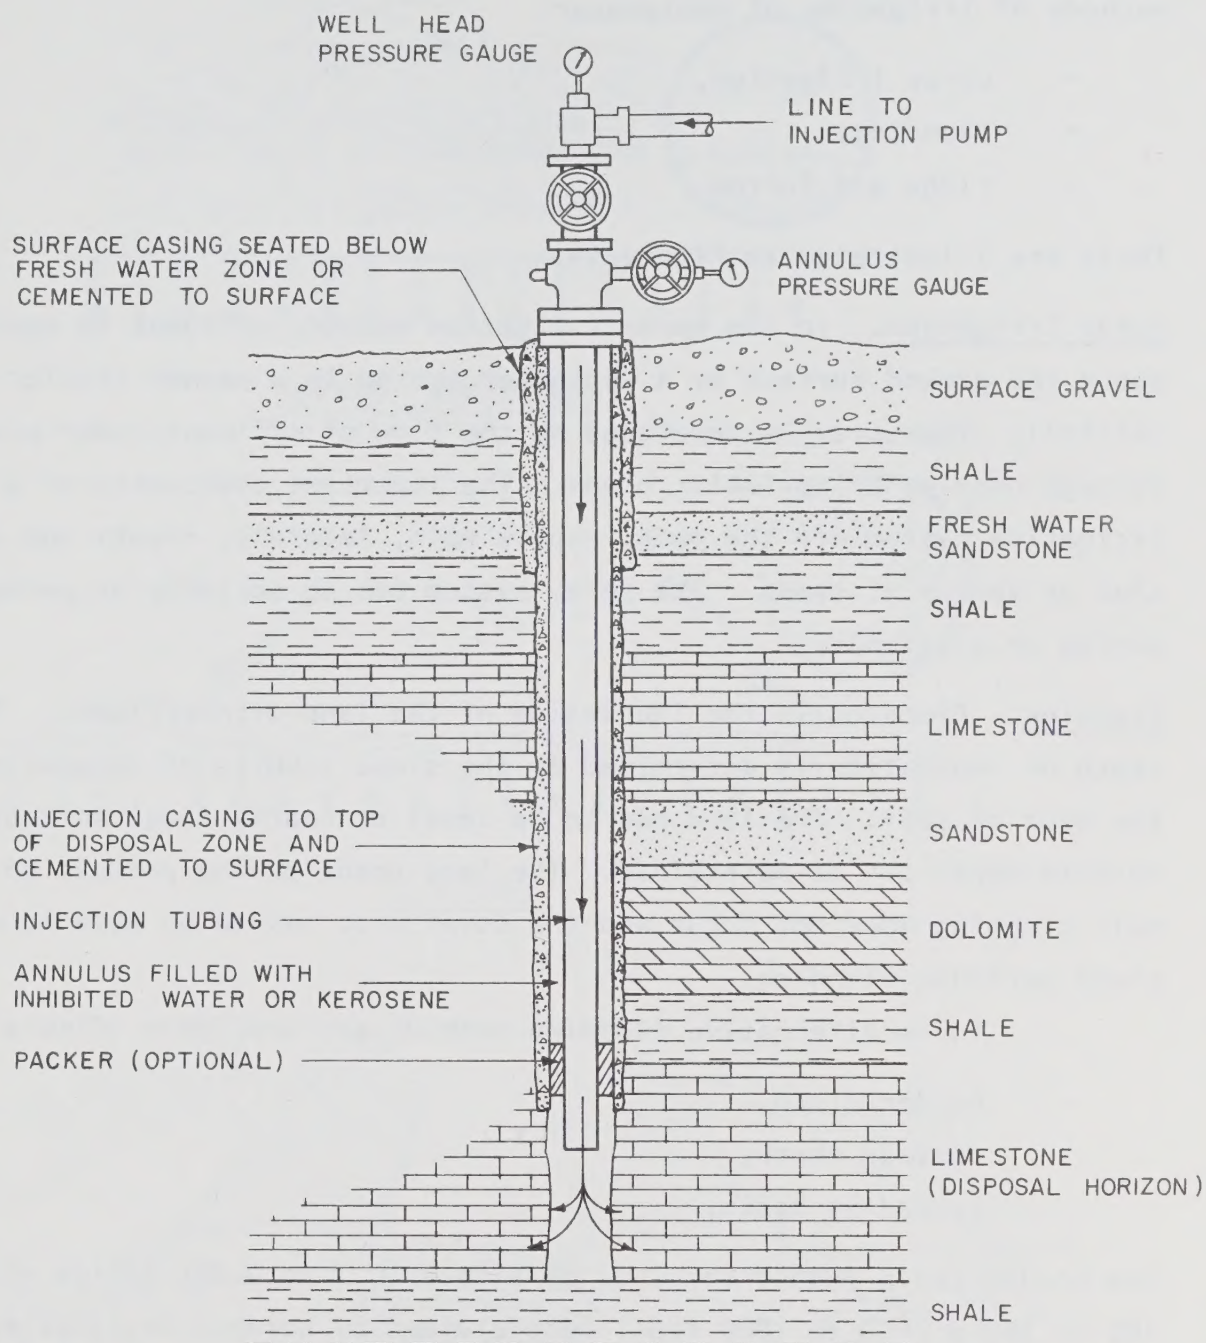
TYPICAL DISPOSAL WELL CONSTRUCTION.
